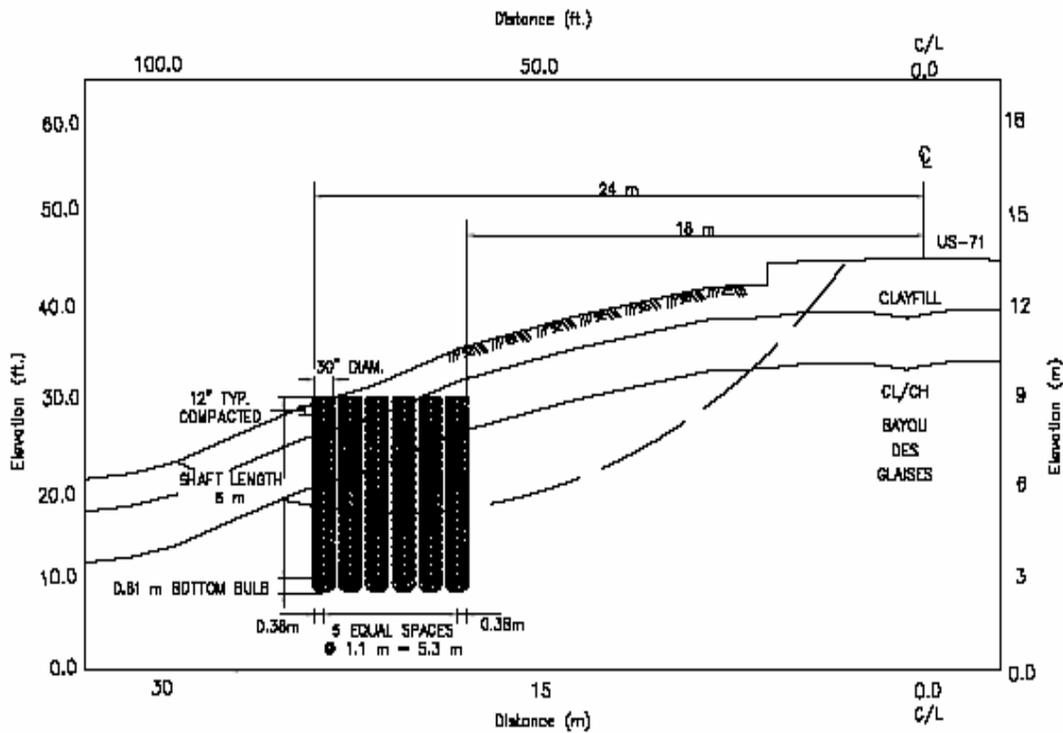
RAP Reinforcement and Stabilization at US-71 Slope Failure.
